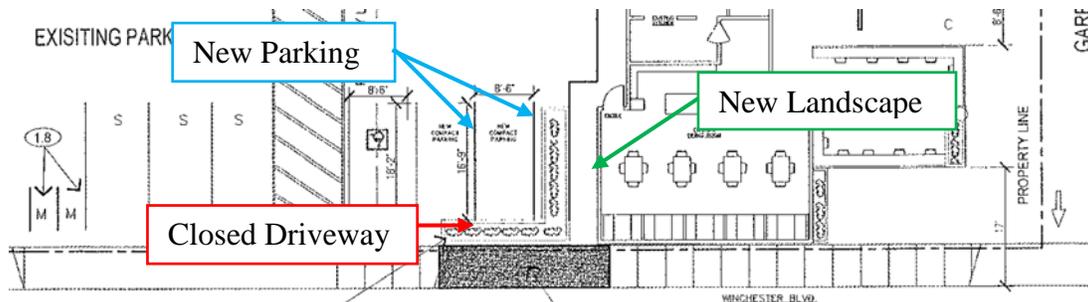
Proposed Parking Stalls within Required Streetscape Setback
